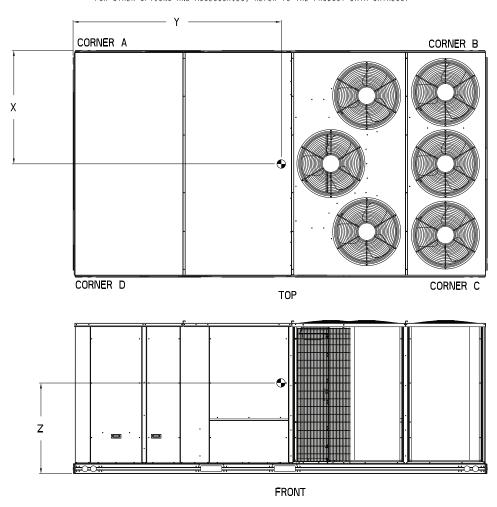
Unit Dimensional Drawing - 30 Size Units (cont.)
